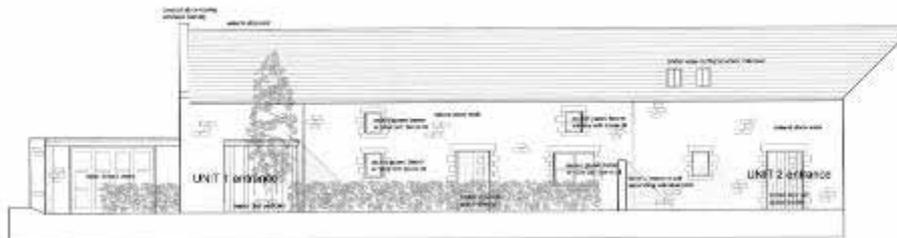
proposed south west elevation (as viewed from courtyard)
